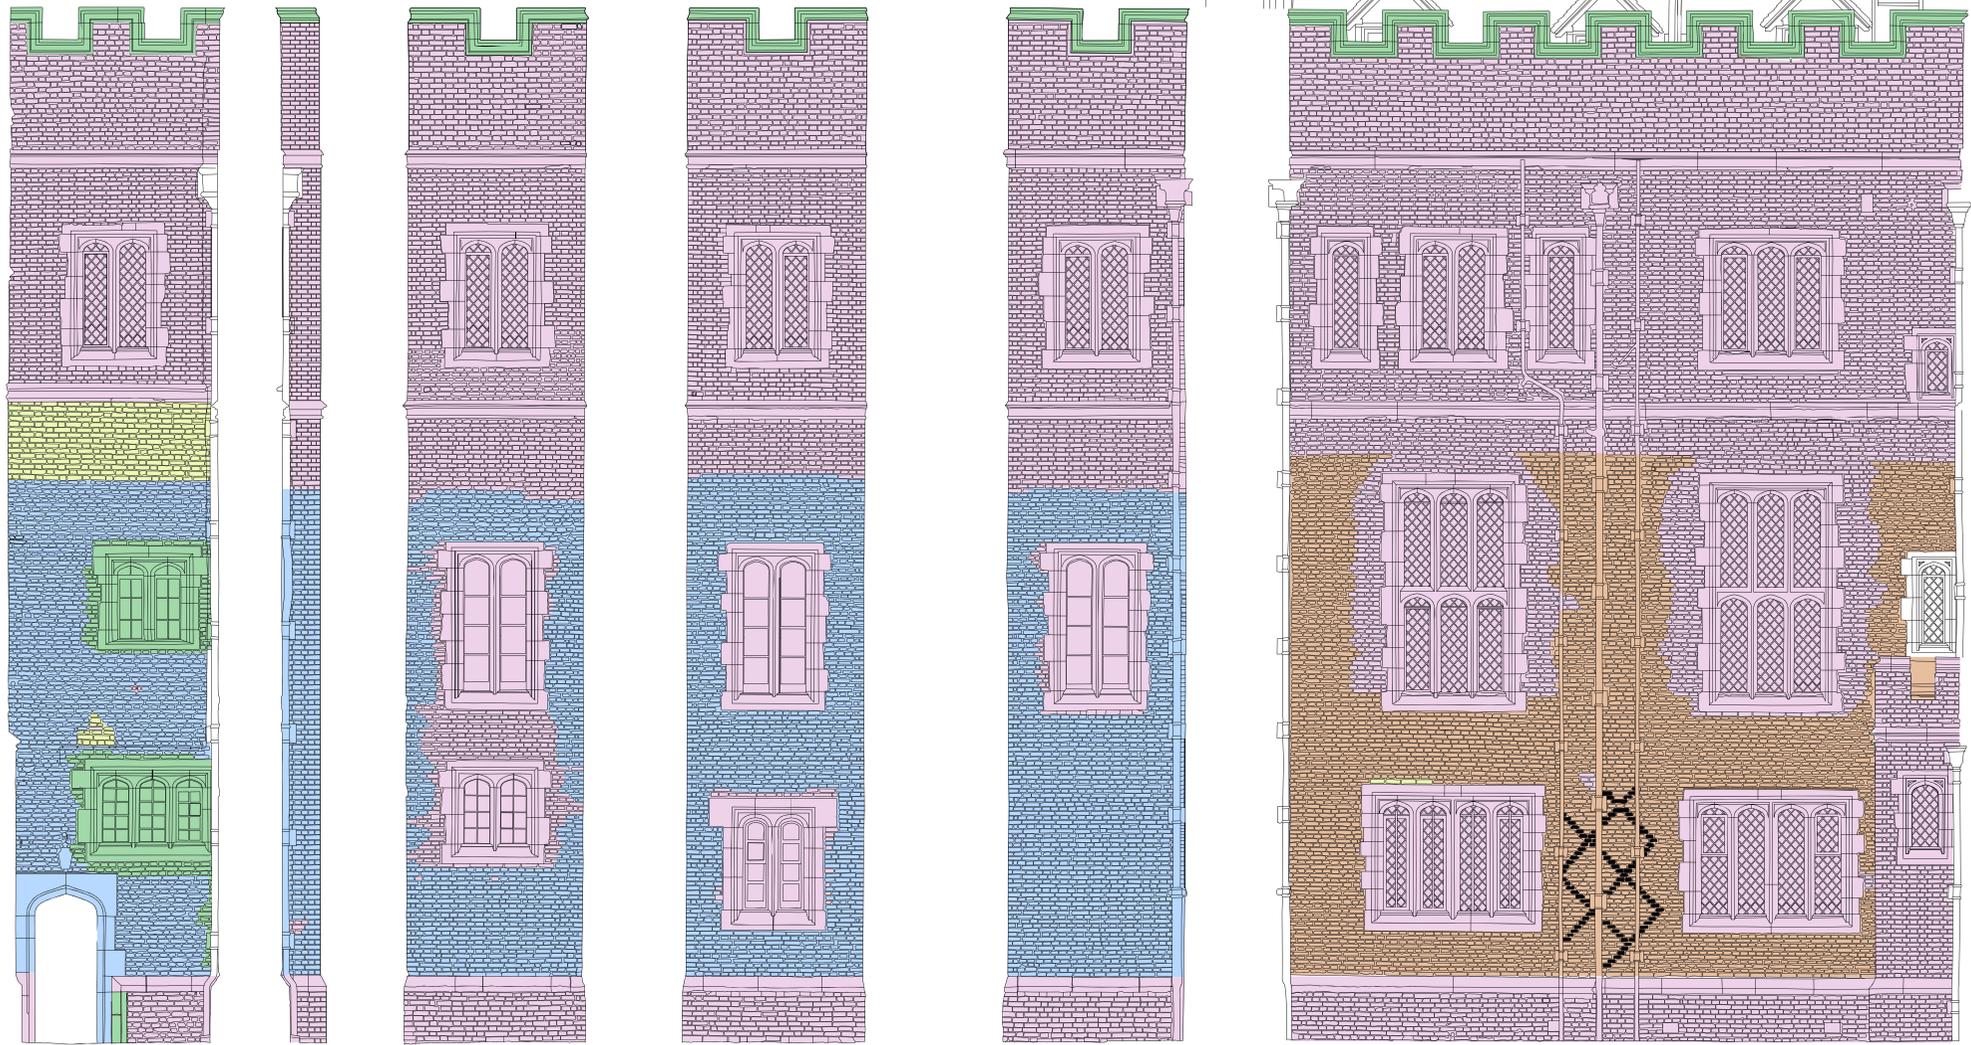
Hampton Court Palace, Chapel Court, East Facing Elevation - Plan showing location of works
